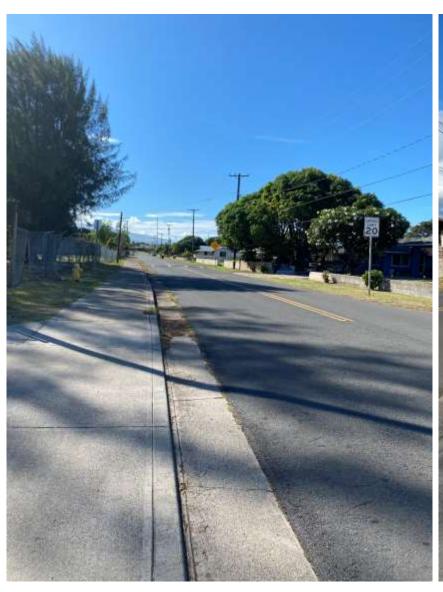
Kaulawahine Street looking toward Wakea Avenue. Project site is on the left
